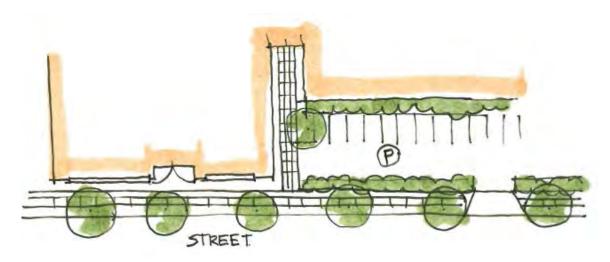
Parking located to the side or rear of the building, where visible from the street should be screened with landscaping.
